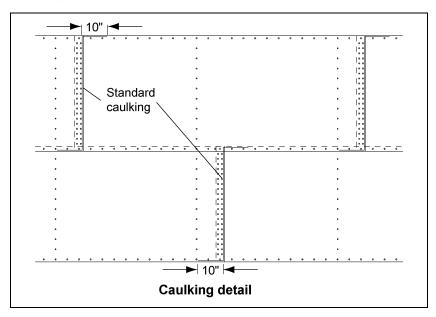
C Standard Sidewall Sheets (As Viewed from Outside Bin)
